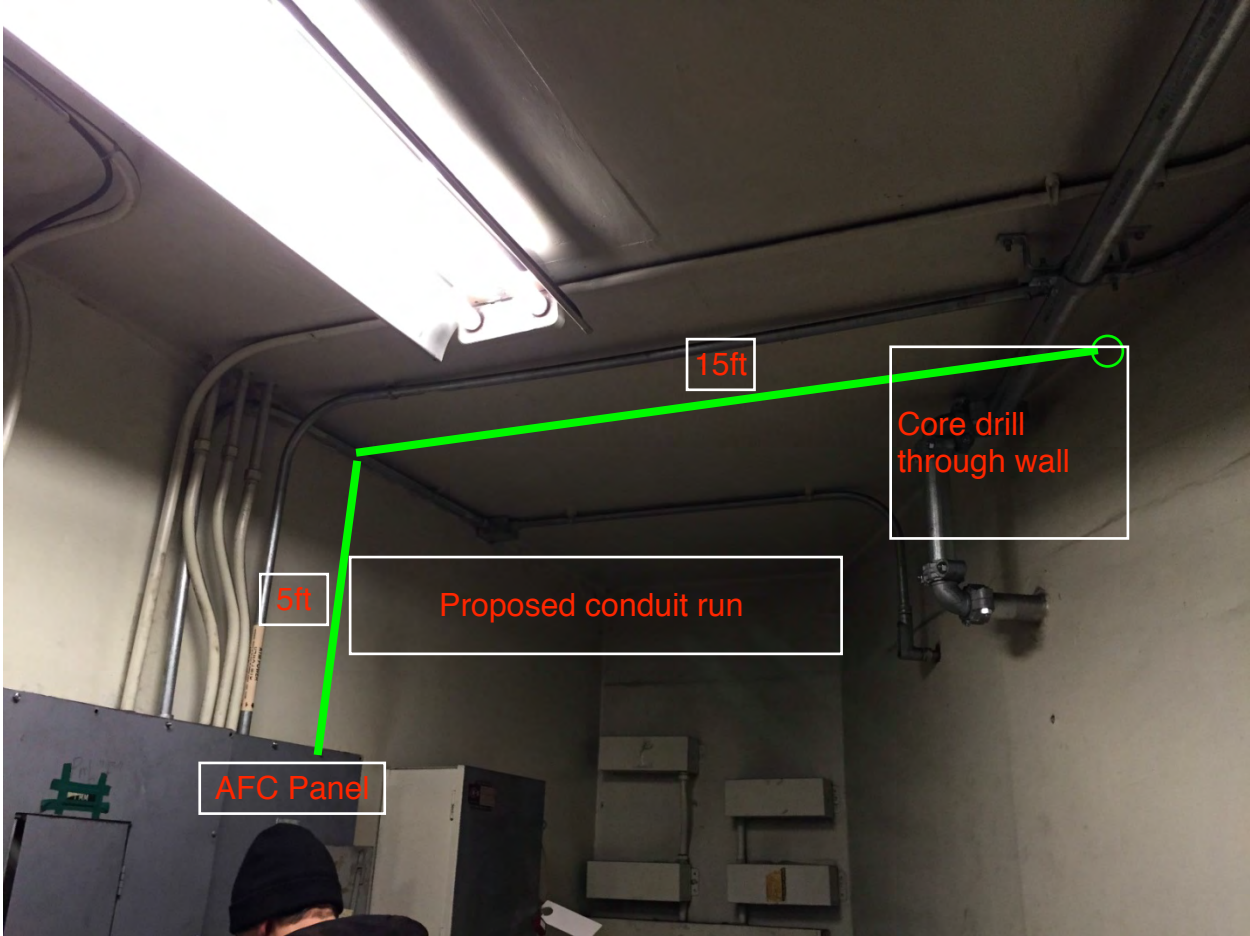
Proposed conduit run across Room C204 and down into AFC Panel
